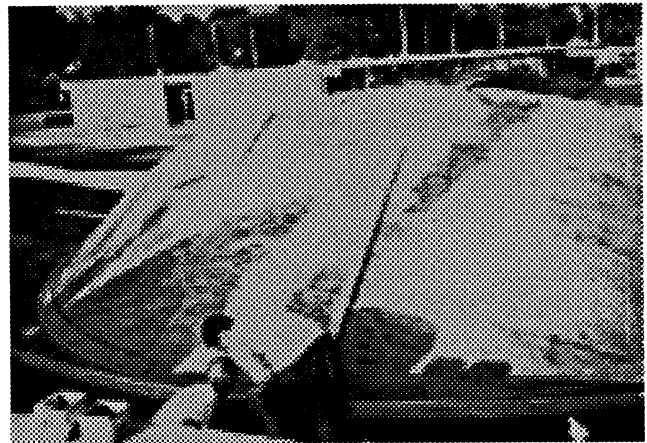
Laminated attachment of edge bead. Edge beads serve as stiffeners and gutters to channel water to valleys at pier connection.
